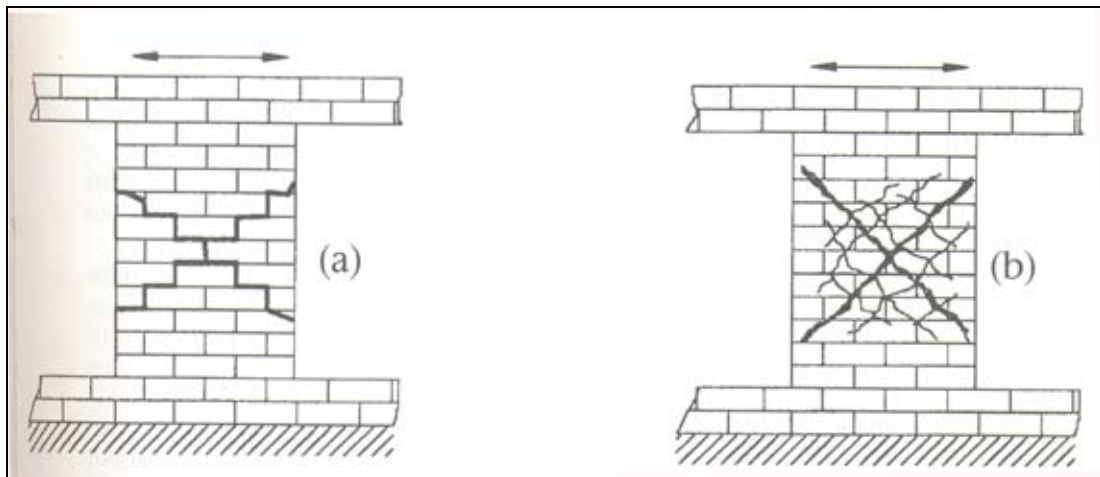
Shear crack development in (a) unreinforced masonry and (b) reinforced masonry
